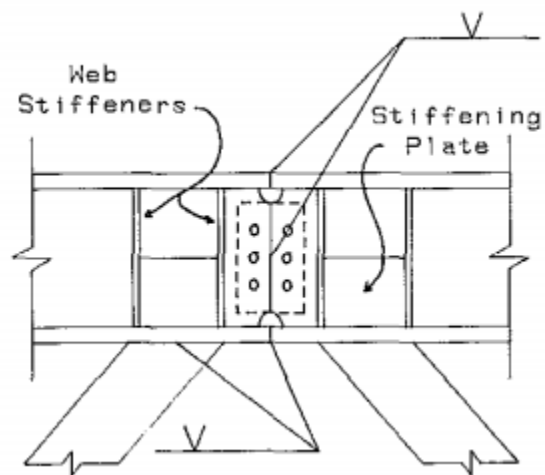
Chevron beam splice detail used in U.S./Japan 6-story tests.
